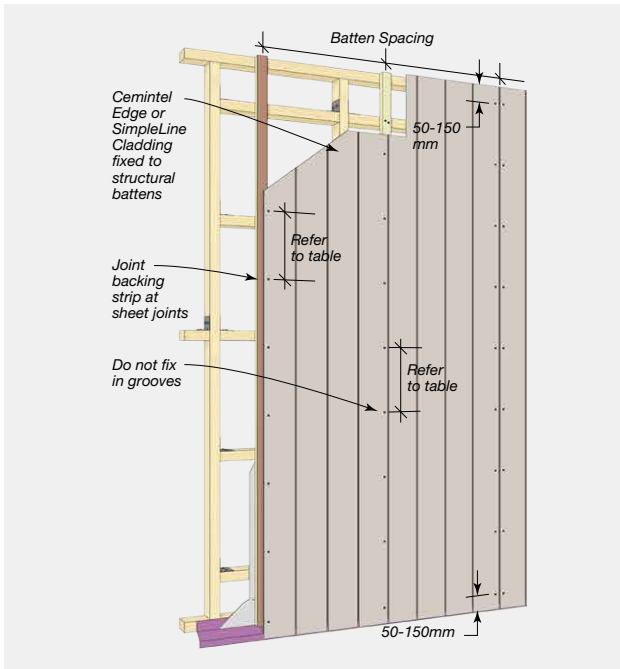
Typical 'On-stud' Arrangement of Cemintel FC Battens
